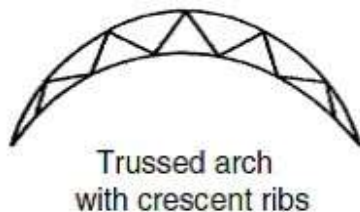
Trussed Arch with Crescent Ribs (Ambrose and Tripney, 2012)
